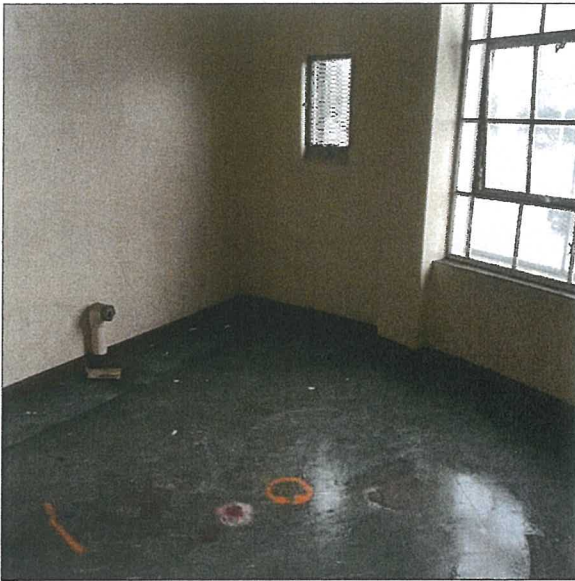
the interior of the building viewed towards the car park entrance on Adams Lane.
